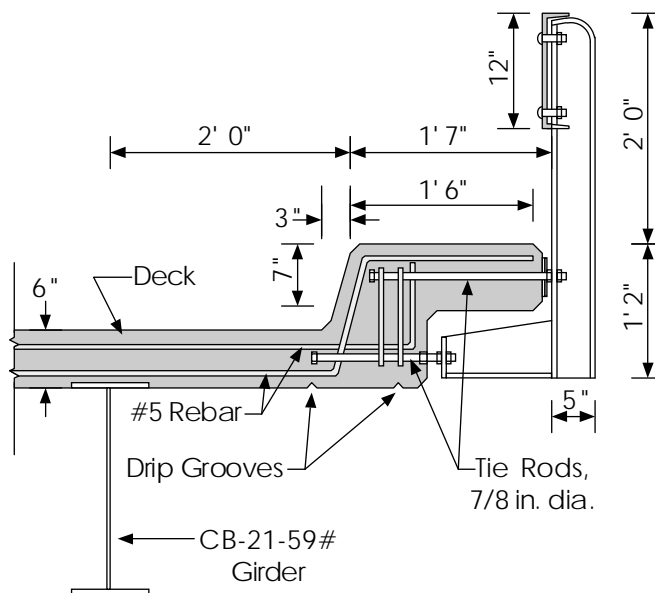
Detail of an Exterior Girder, Curb and Railing
